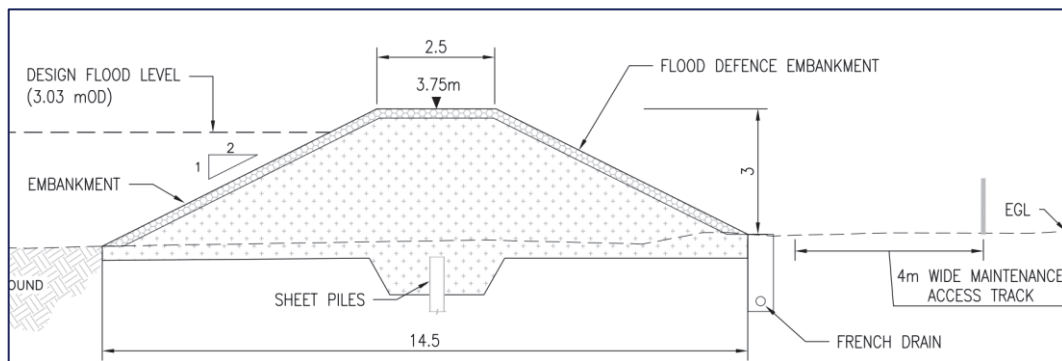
Typical cross-section along flood defence earth embankment. Not to scale.
